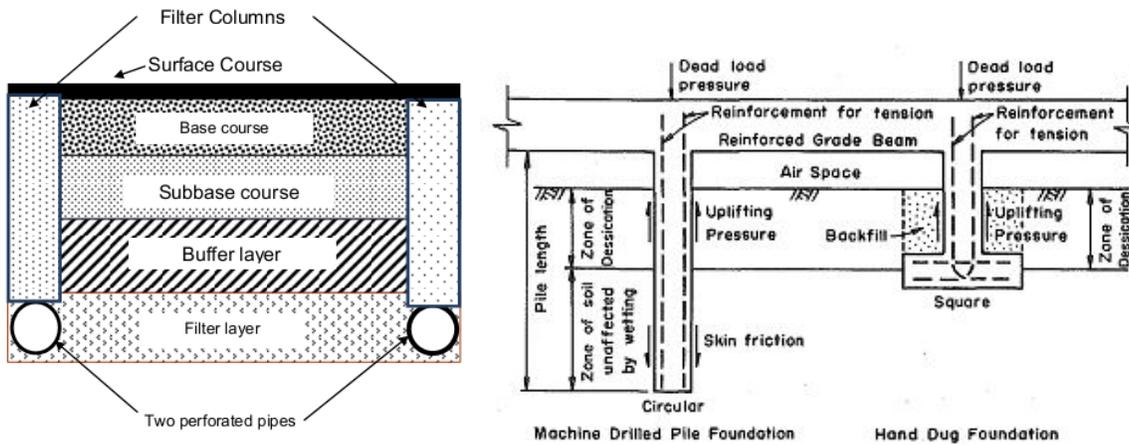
Recommended Pavement Structure for Roads and typical Free Standing Foundation System on Expansive Clay Soils [28]
